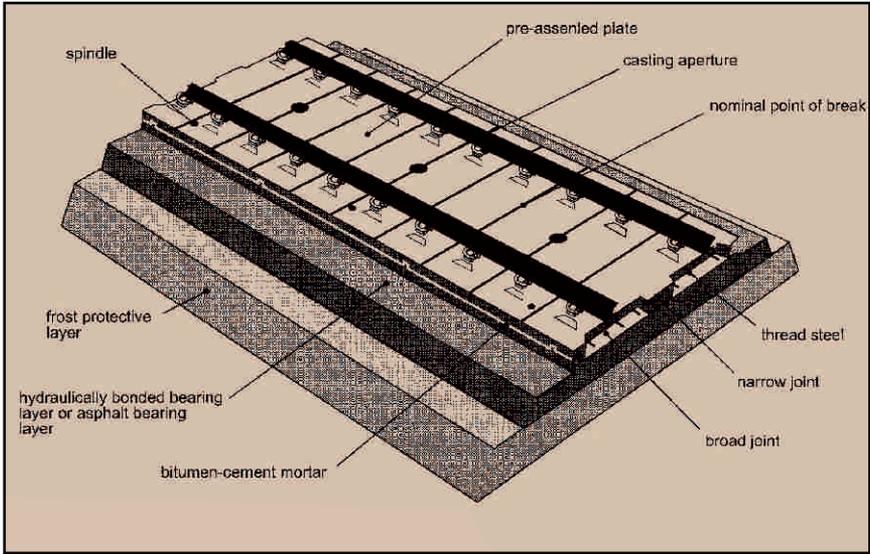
(a) : Bogl design with assembly plates
